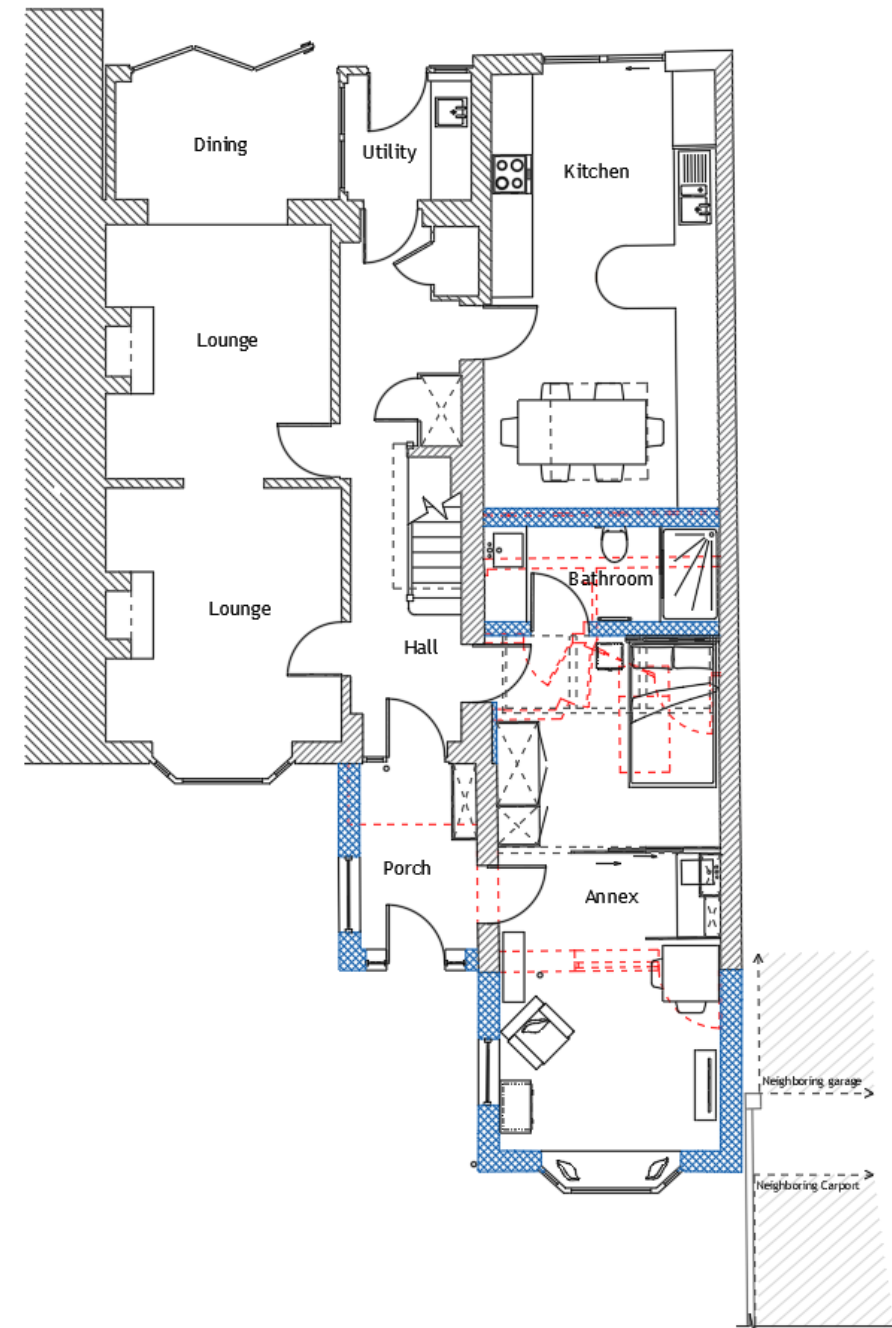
Proposed ground floor illustrating the demolished elements in red dash line
